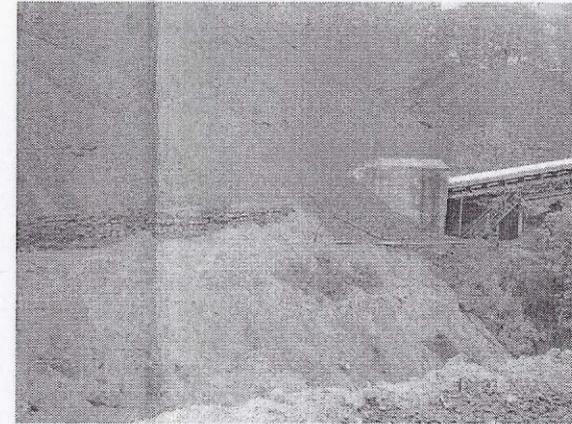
Photo of coal spillage over the walls of the project and adjacent to river Sonadubi
